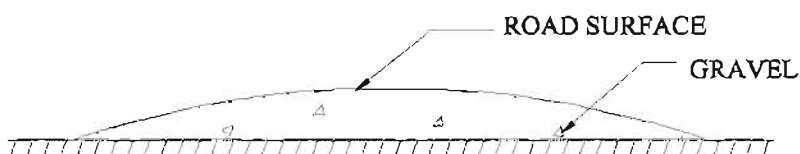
FEATHER EDGE TYPE CONSTRUCTION OF GRAVEL ROAD
